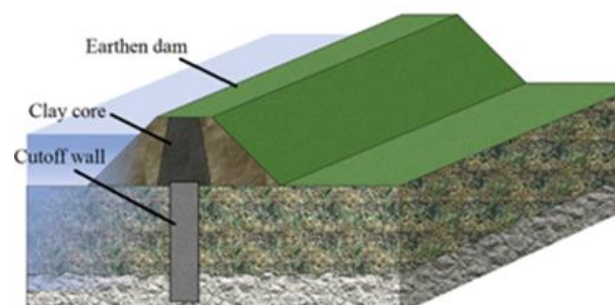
Schematic view of a cutoff wall (Alós et al., 2020)
